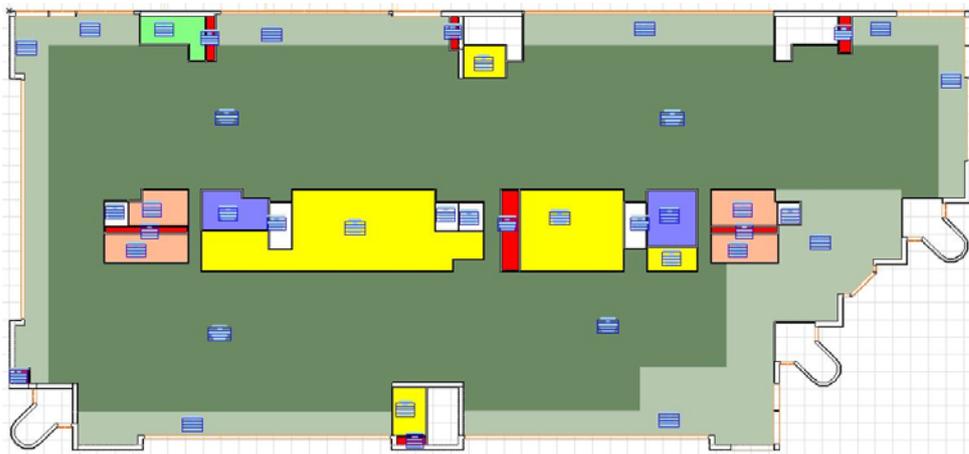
First floor plan from the zone-typed model (revision 2)
